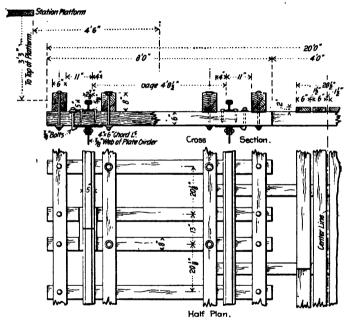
Track and Floor System; South Side Elevated Electric Ry. (Chicago).
